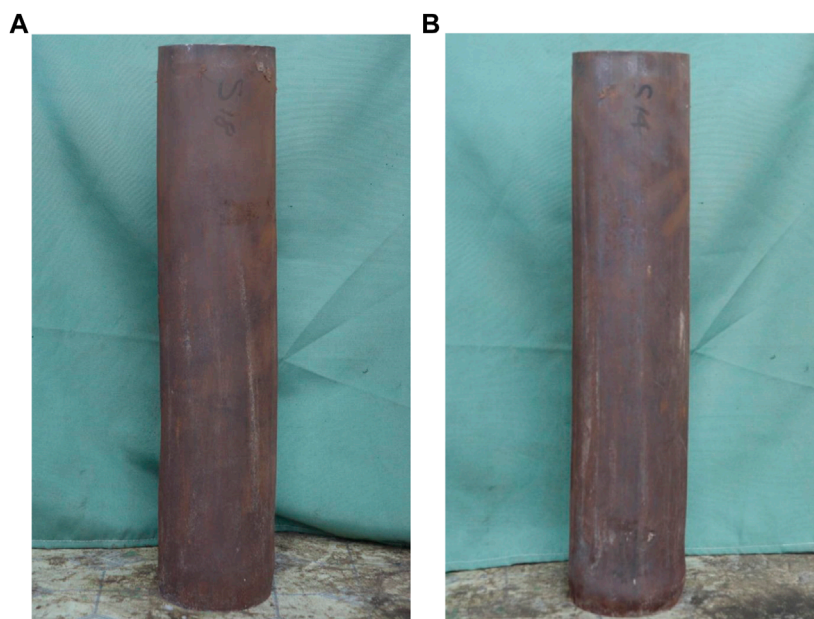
Short columns. (A) BFRC-filled steel tube. (B) Concrete-filled steel tube.
